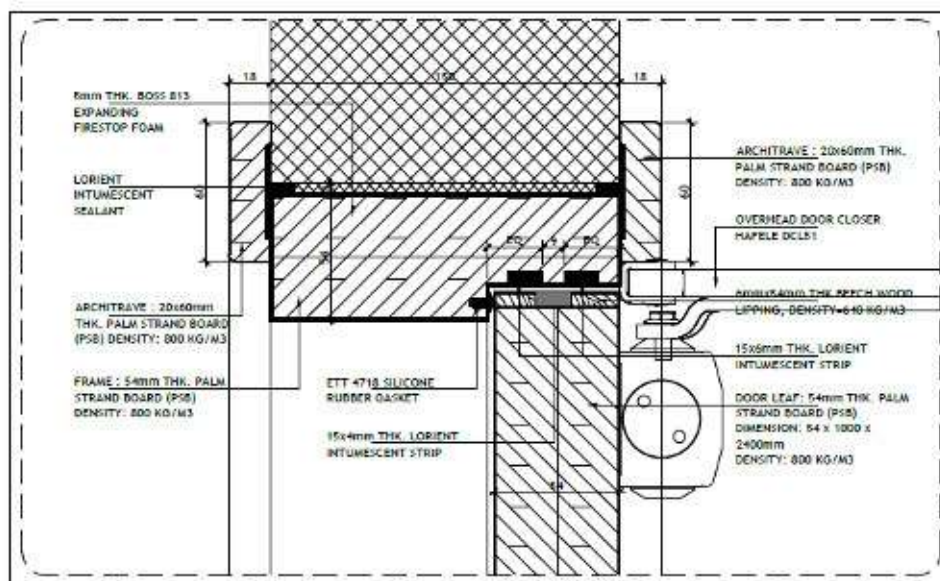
Cross-section of door 2 having PSB as the frame and architrave.
